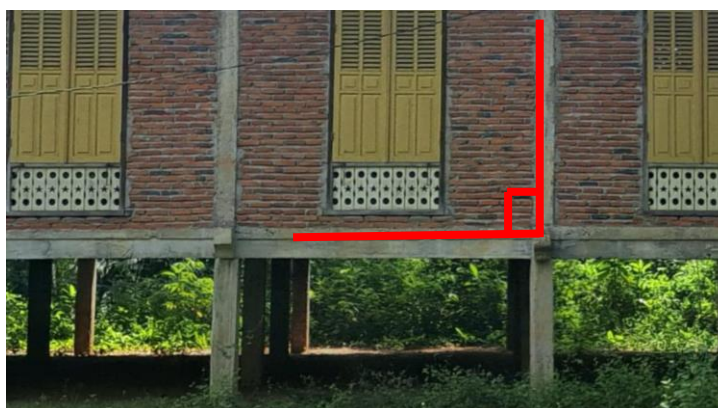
Wall of the Godang House of the Pitopang Baghua Tribe
